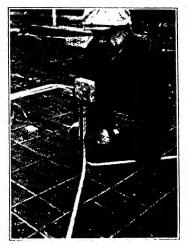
Method of Fastening Conduit to Supporting Bracket and Outlet Box
